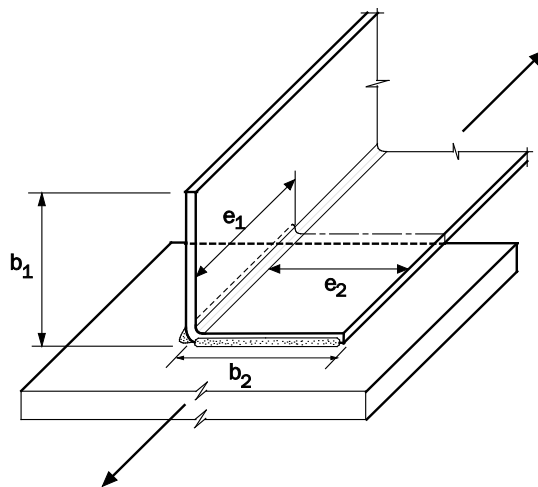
Potential Failure Path of Fillet-Welded Joint (Tension Rupture)
